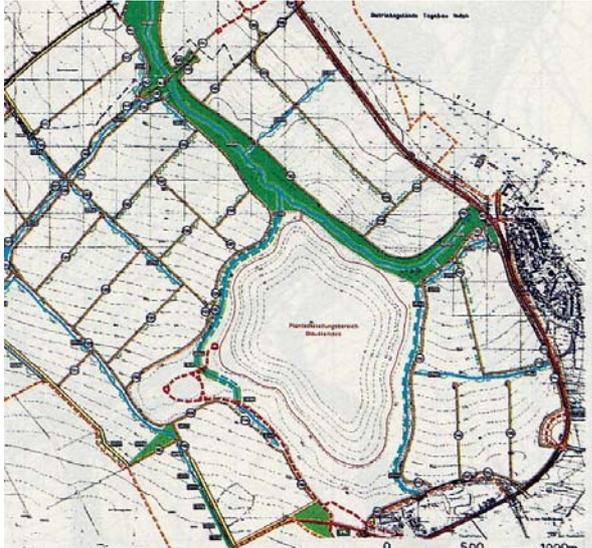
Road and Water Resources Plan with landscape conserving accessory plan
